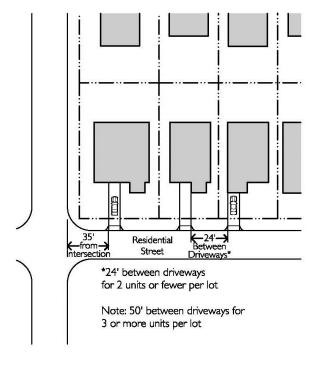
C.3.a. Driveway Separation for Boulevards, Avenues, and Collectors
